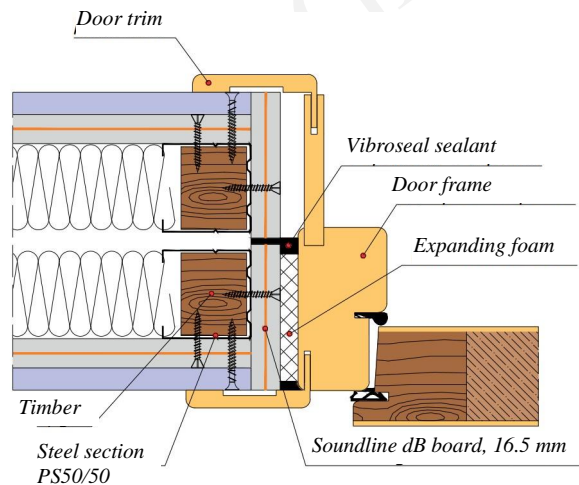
Door opening in the structure of soundproofing framed partition on double (independent) frame.
